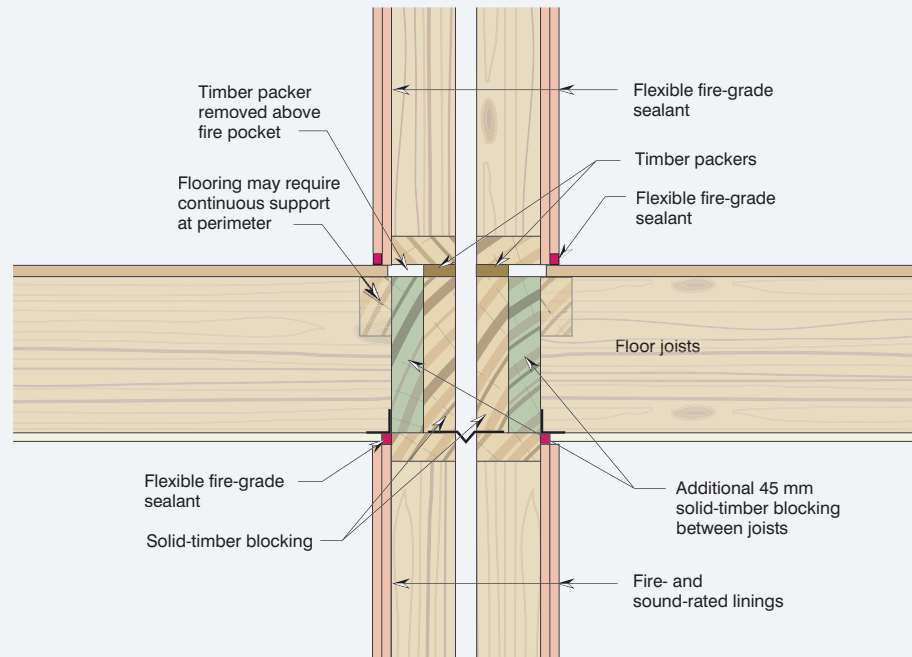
Pockets created in separating wall to accommodate floor joists – FRL 60 minutes only – elevation view.
